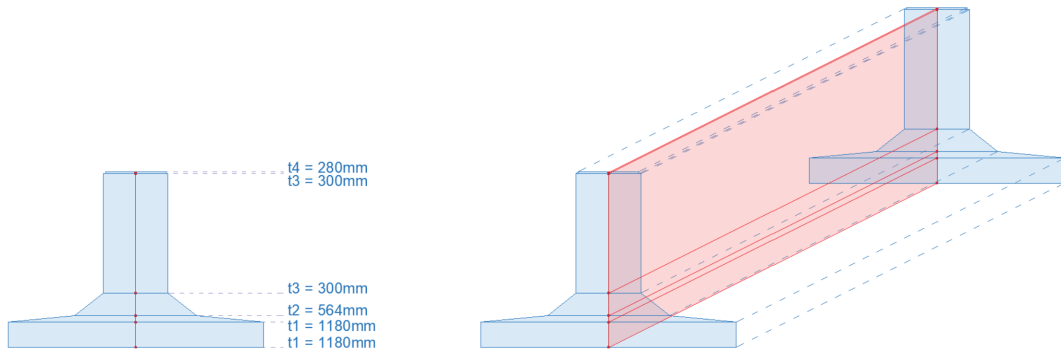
Modelling of the precast beams using vertical shell elements with varying thicknesses.
